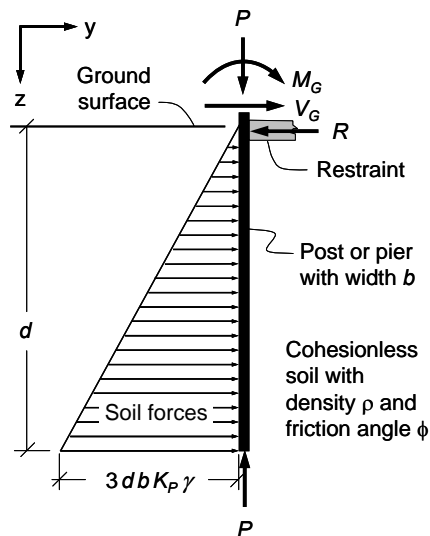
Forces acting on a constrained foundation of fixed width  $b$  in cohesionless soil at failure.
